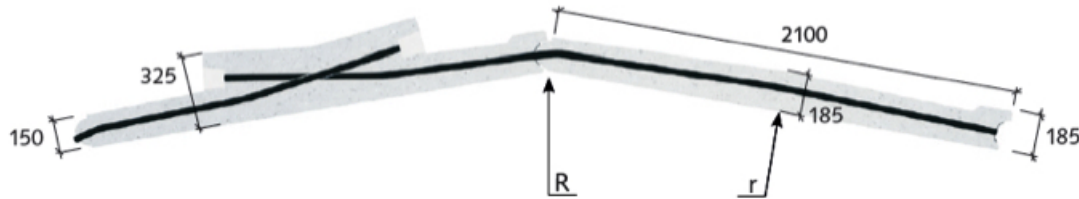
Layout of post-tensioned steel inside a horizontal section of two adjacent concrete panels, Abetong (2015).
